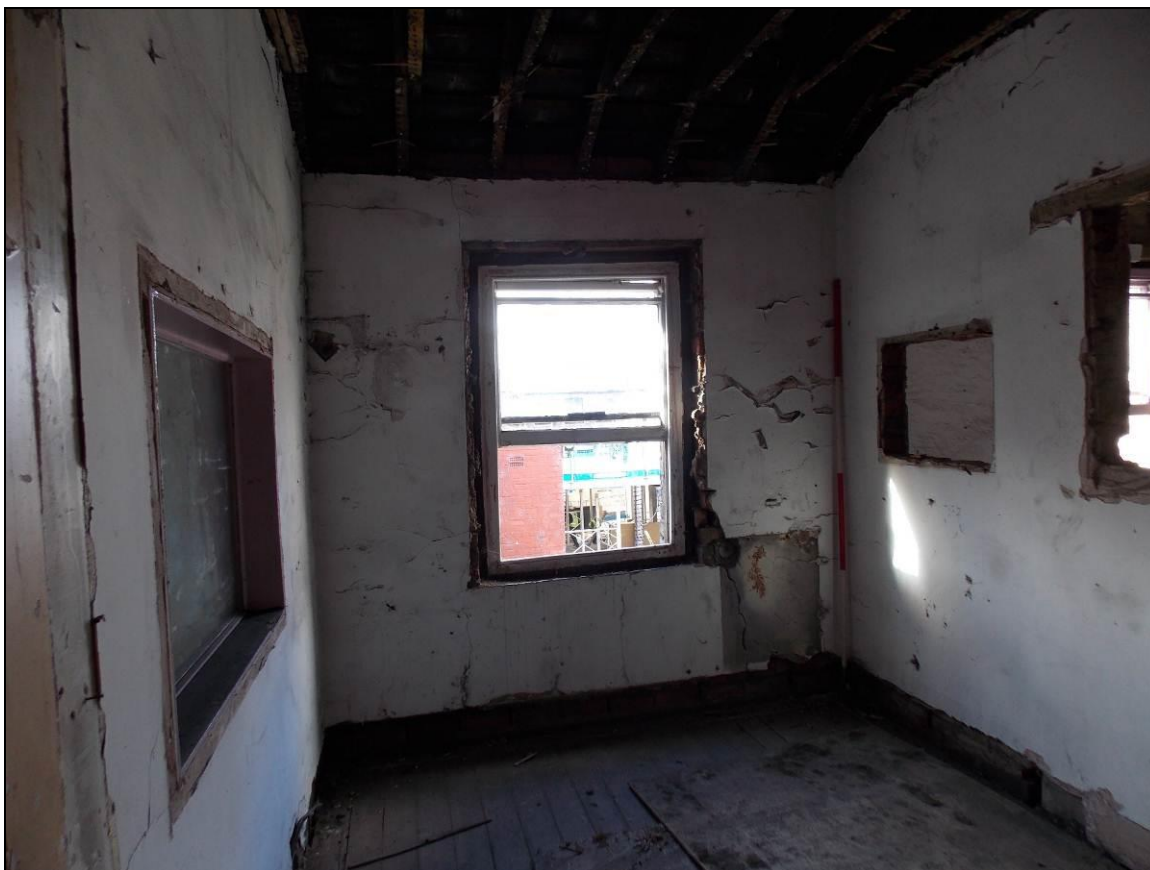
View of the central first floor room in the former office block, facing west, 2m scale.
